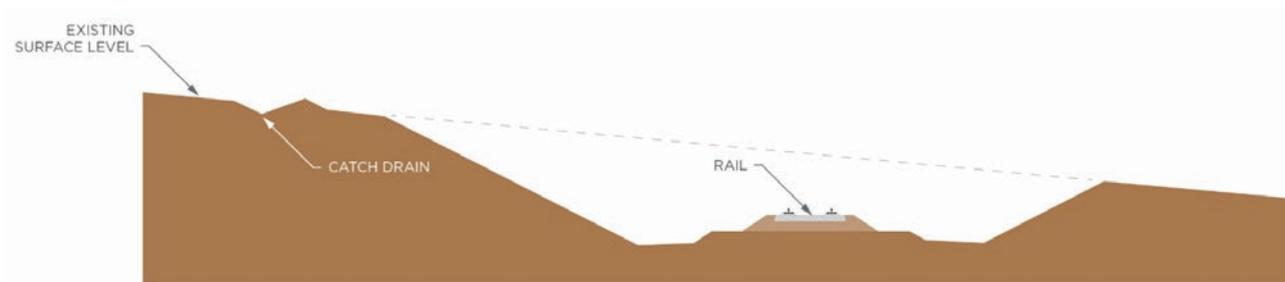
TYPICAL LONGITUDINAL DRAINAGE FOR RAIL FORMATION WITHIN A CUT
